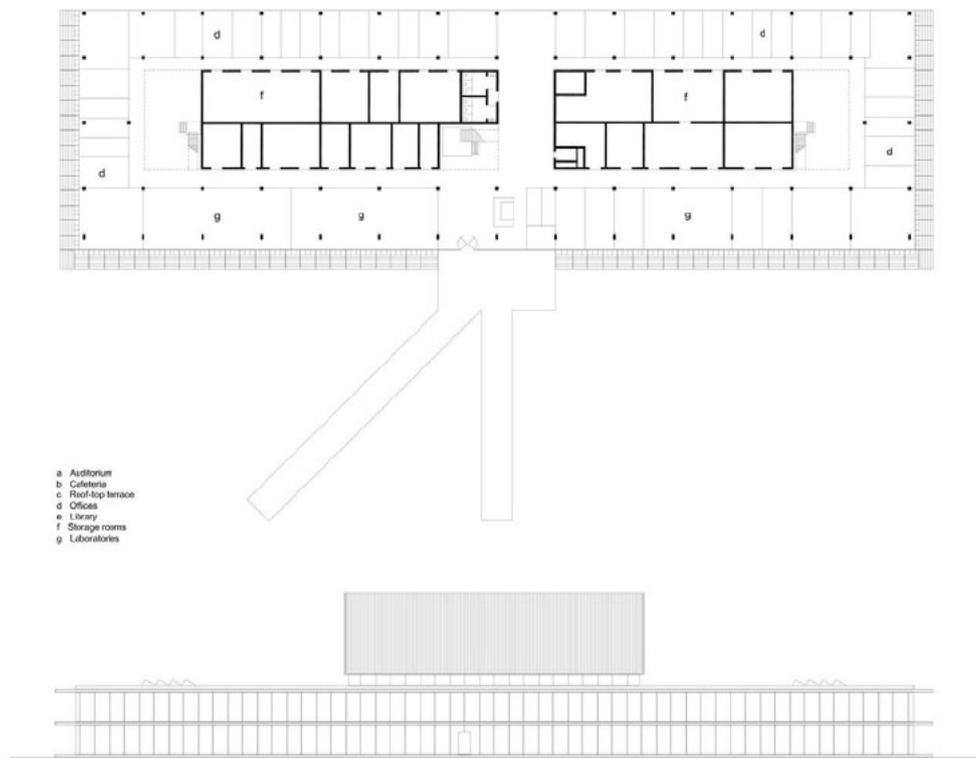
Open Floor plan and elevation maximising efficiency of the floor plate Source:
